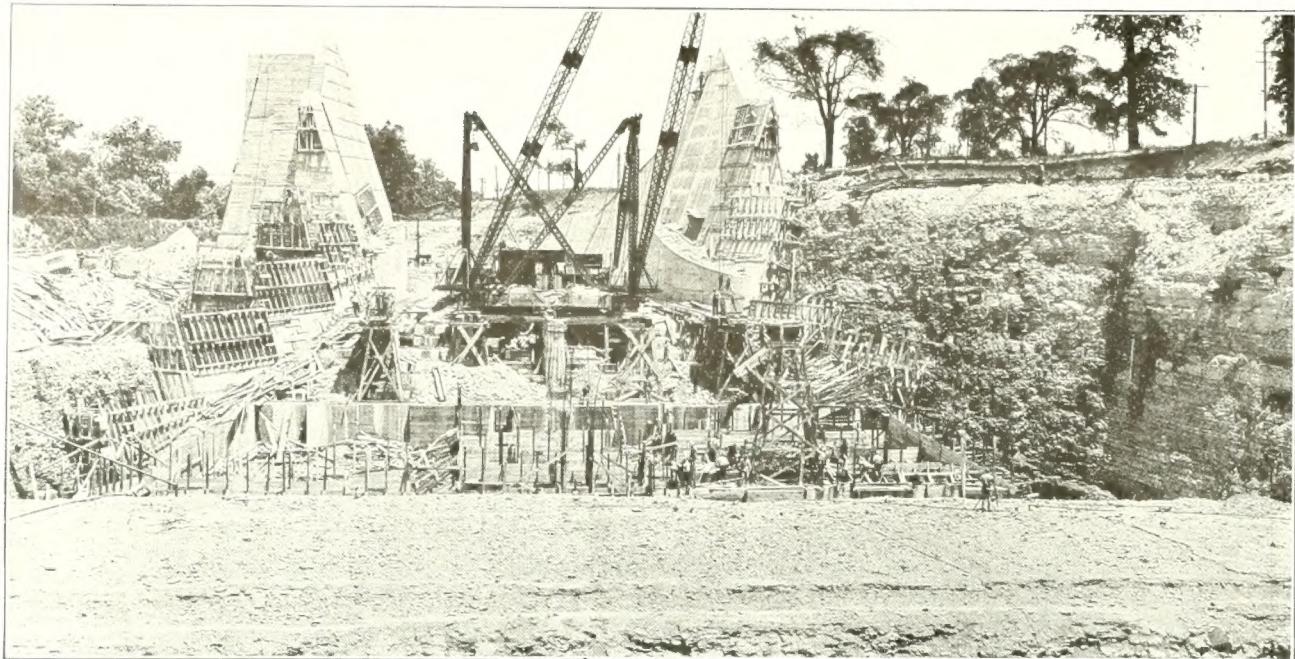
CONCRETE OUTLET, HUFFMAN DAM, LOOKING UPSTREAM, JULY 10, 1919.
